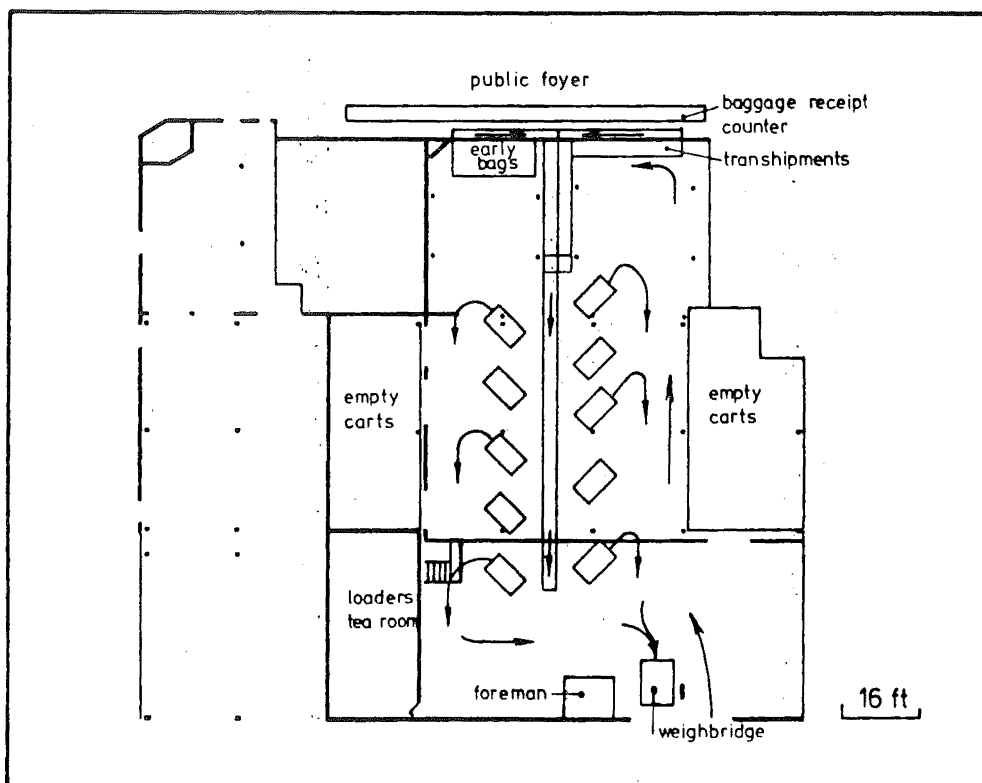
BAGGAGE MAKE-UP USING EXTENDED CONVEYOR SYSTEM
